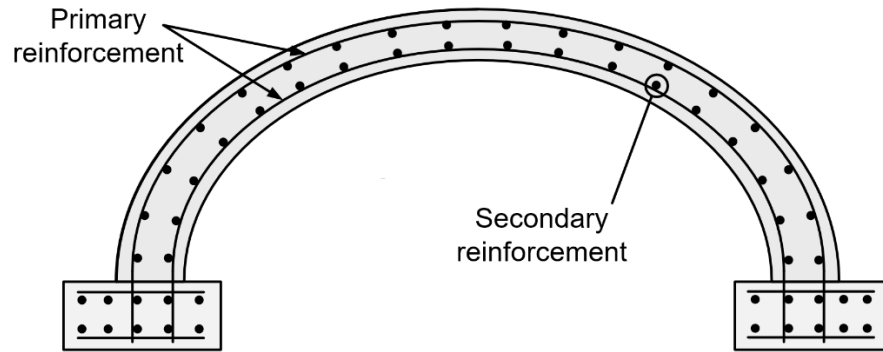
Steel Reinforcement in a Concrete Arch Culvert
